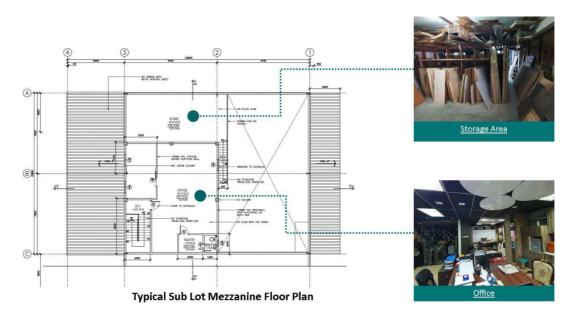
Typical Sub Lot Industrial Building Mezzanine Floor Plan
